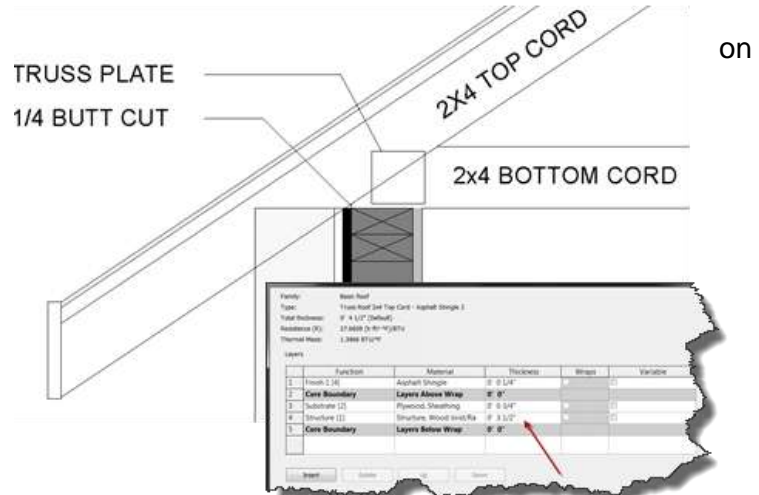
Proper Structural Geometry is Essential so Support Prefabricated Workflows. An eave detail set up for trussed roof is shown here.
